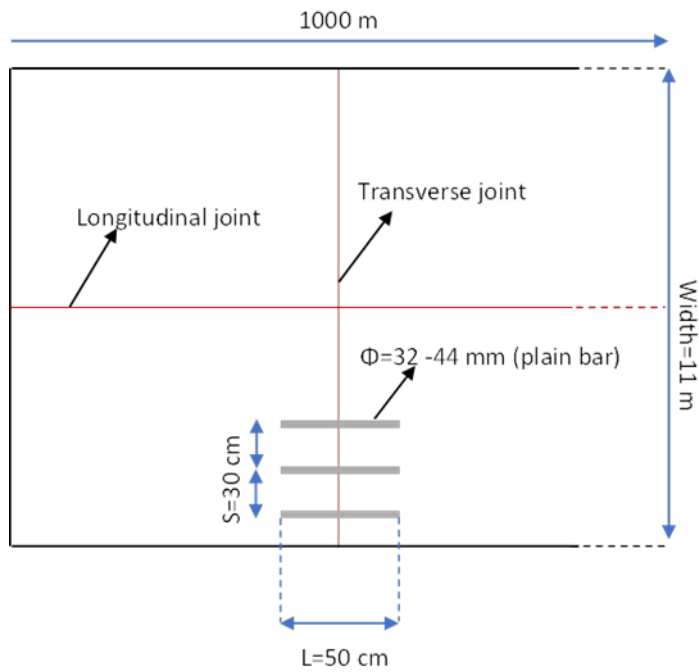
Layout of Dowel Bars According to Concrete Pavements Design Guide of KGM
